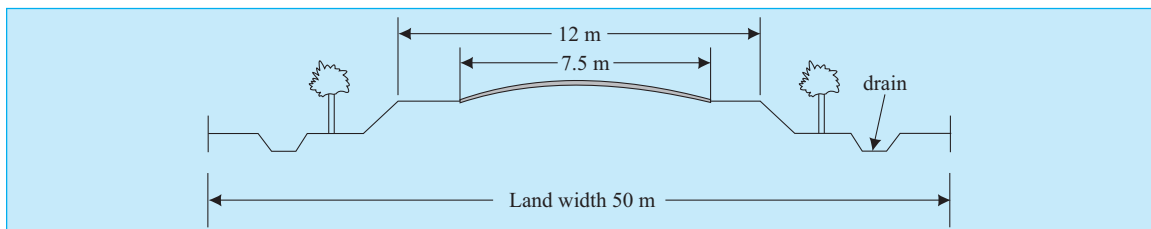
Cross-section of two-lane NH or SH in rural area
